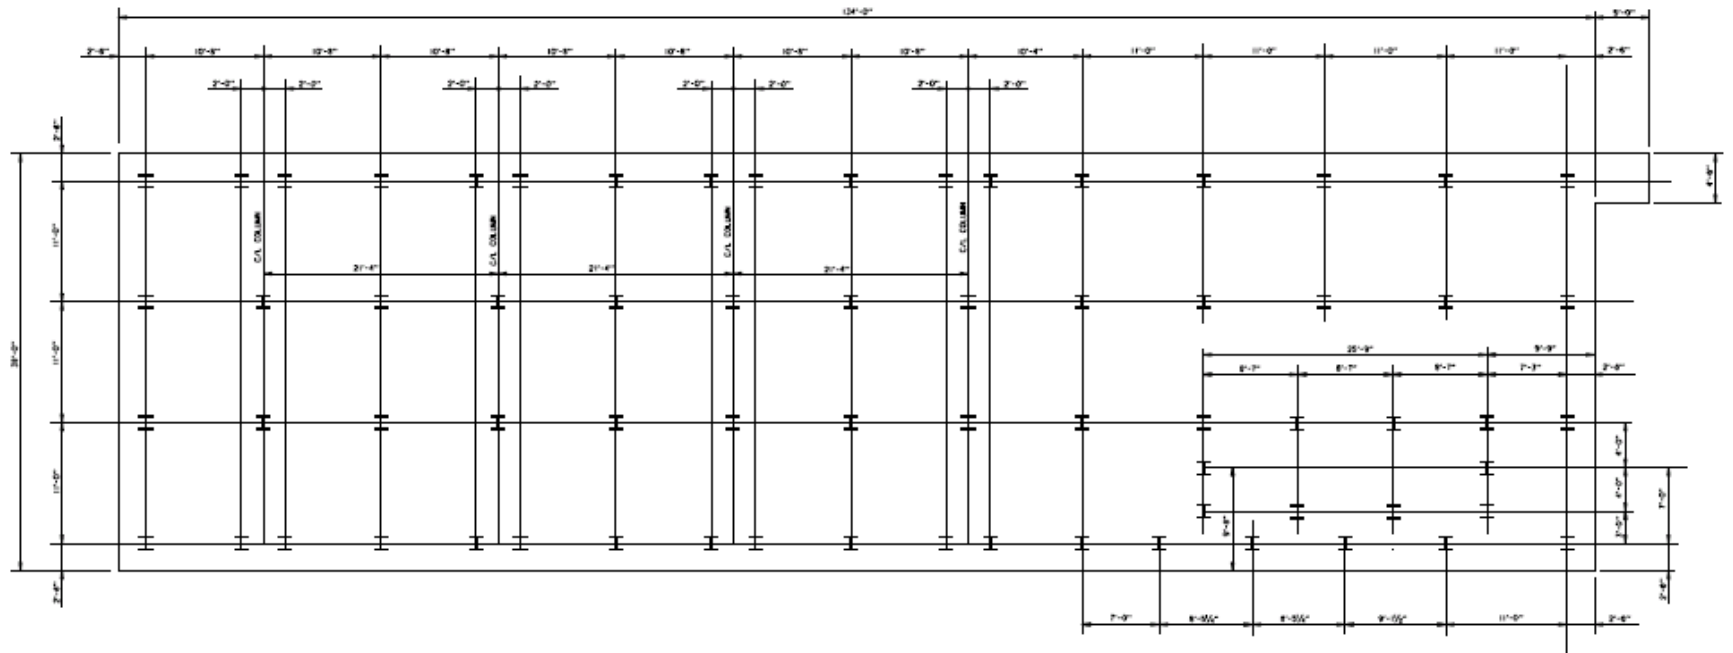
Orleans Avenue Typical Phase 1 Engine Platform Plan
